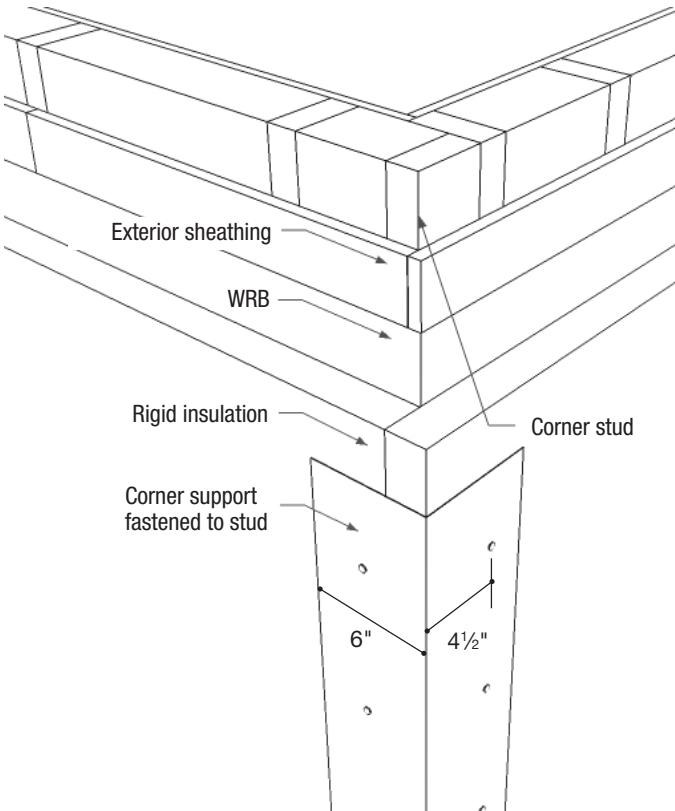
CORNER SUPPORT FASTENED THROUGH INSULATION
